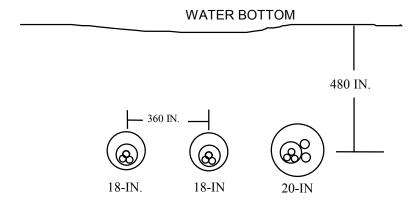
Potential cross-section of pipe-type cables in borings (not to scale)
